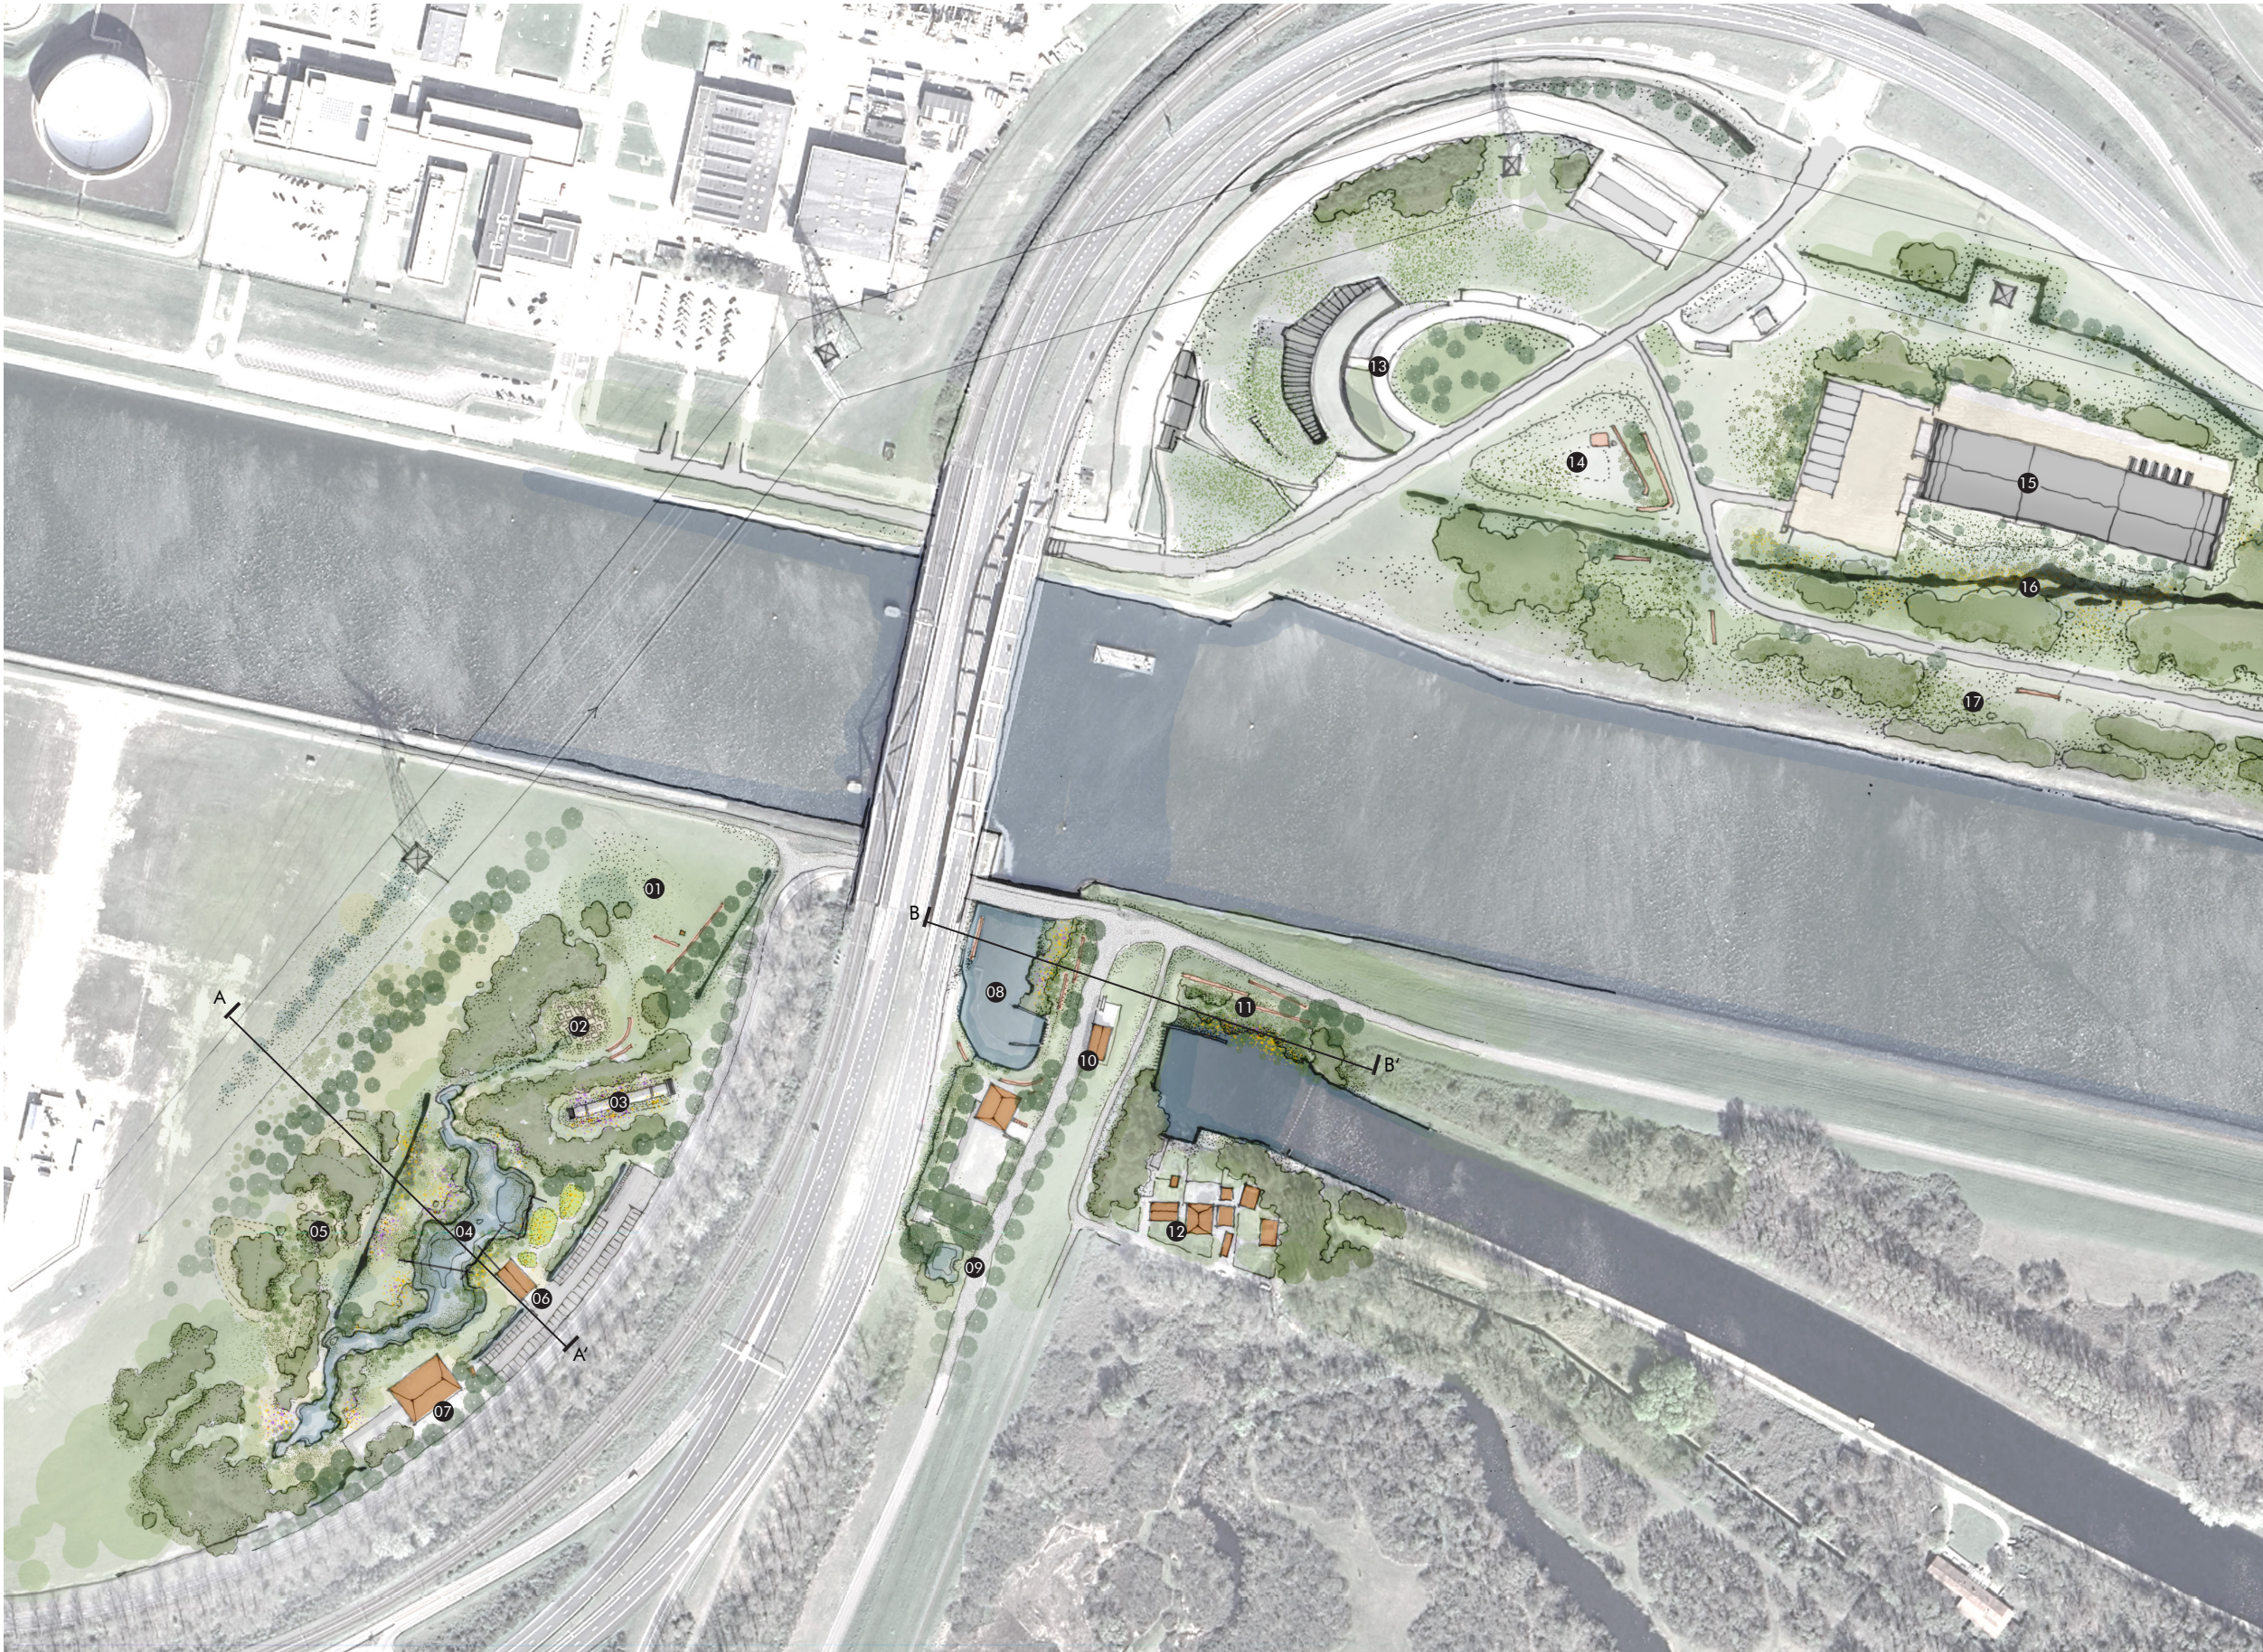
# DETAIL PLAN- EXPLORATION GARDEN AND PORTHOR OFFICE
